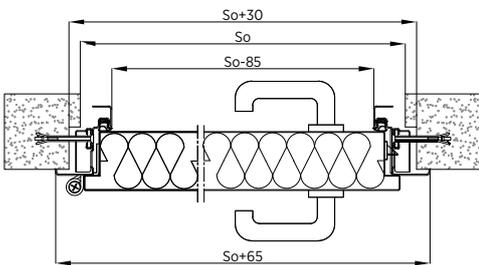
Installation of the single-leaf door to a masonry wall - corner frame with a thermal break - horizontal cross-section
